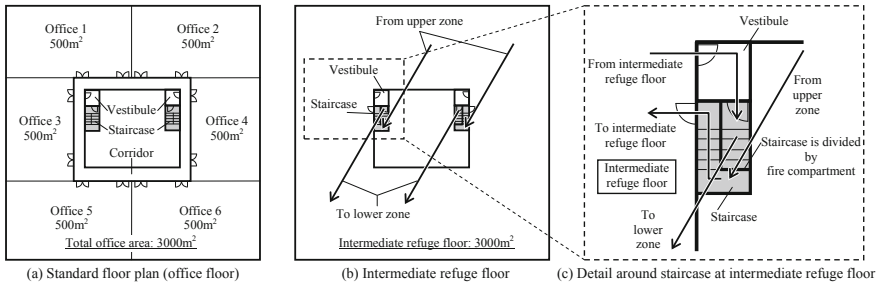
Conceptual diagram of model building and intermediate refuge floors (plan)
